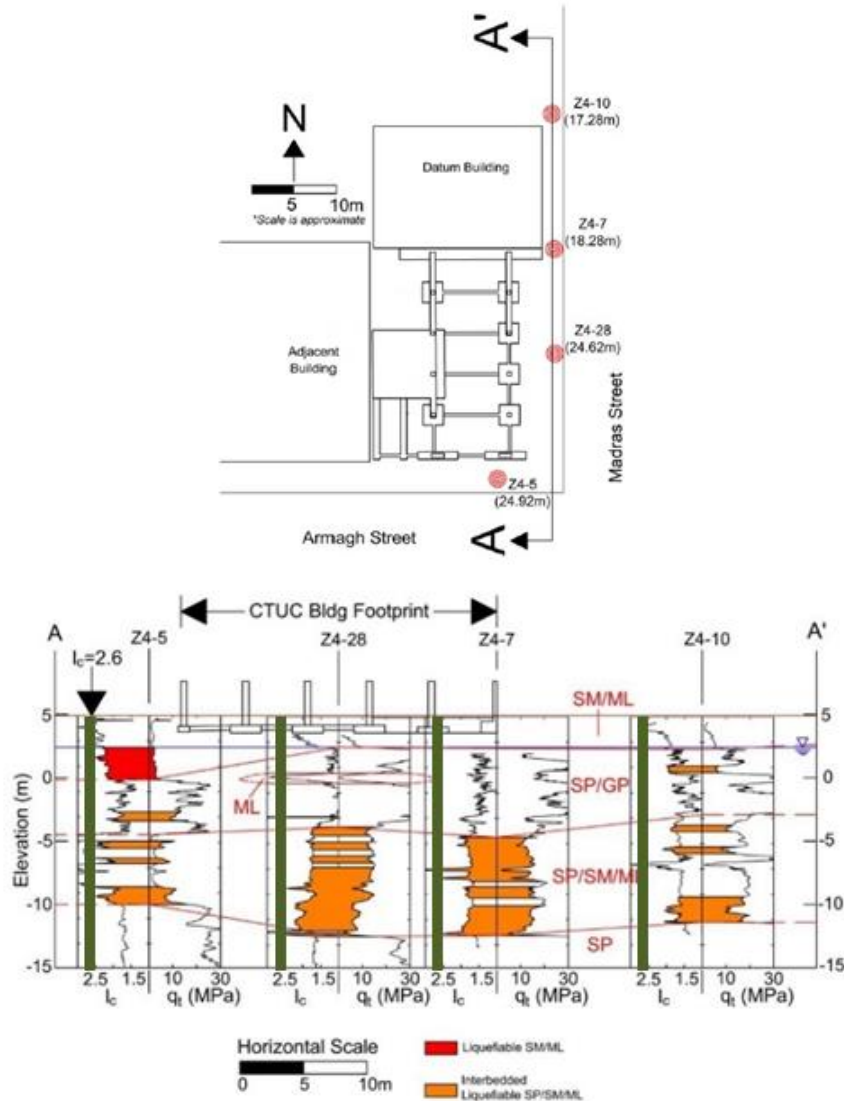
Plan view (top) and section A-A' (bottom) of the CTUC building (Zupan 2014).
